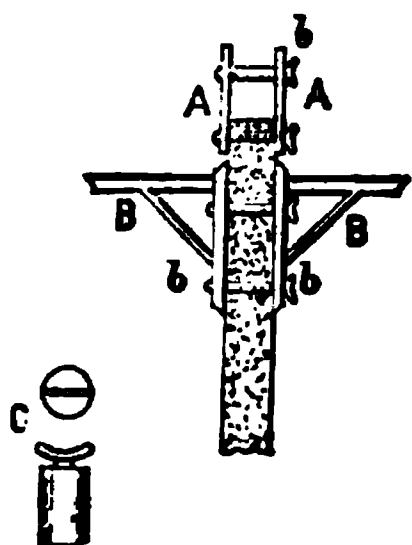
represents a vertical section of the boxing for laying concrete walls.
